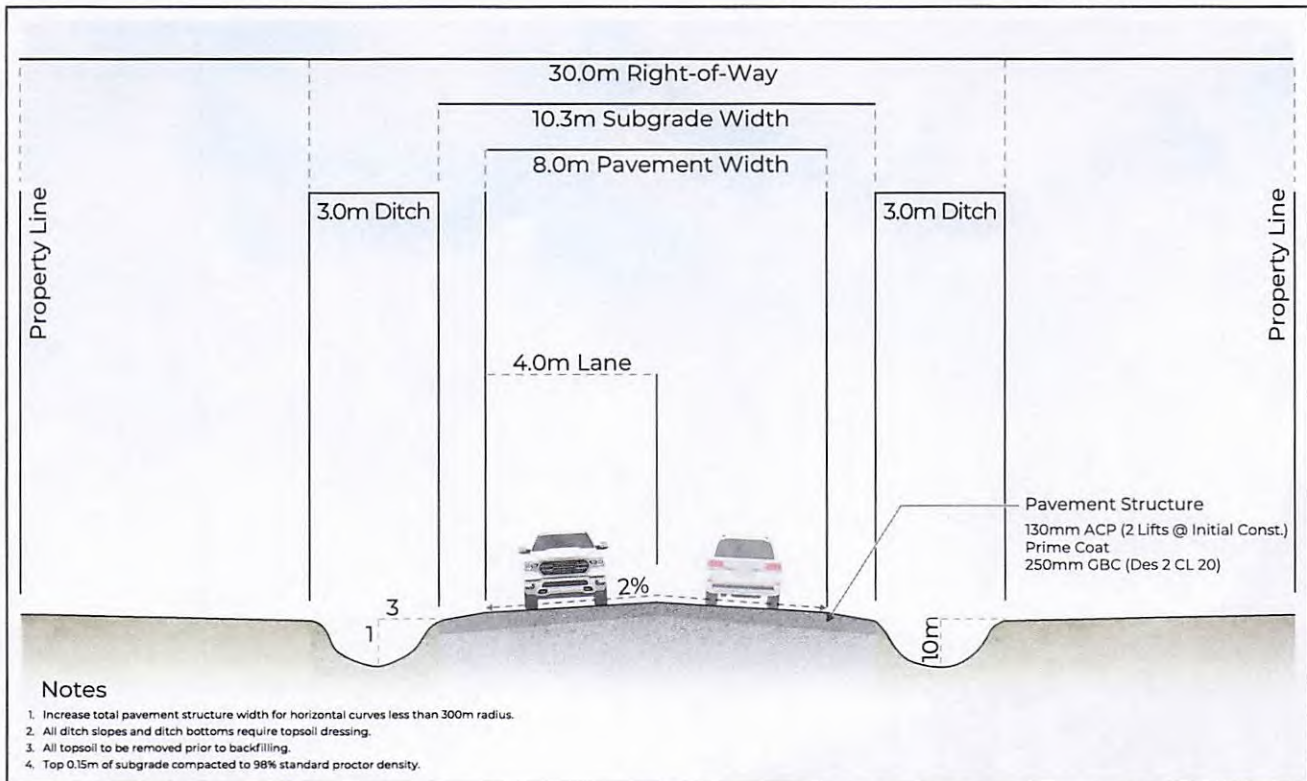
TYPICAL COMMERCIAL INTERNAL ROAD CROSS SECTION
